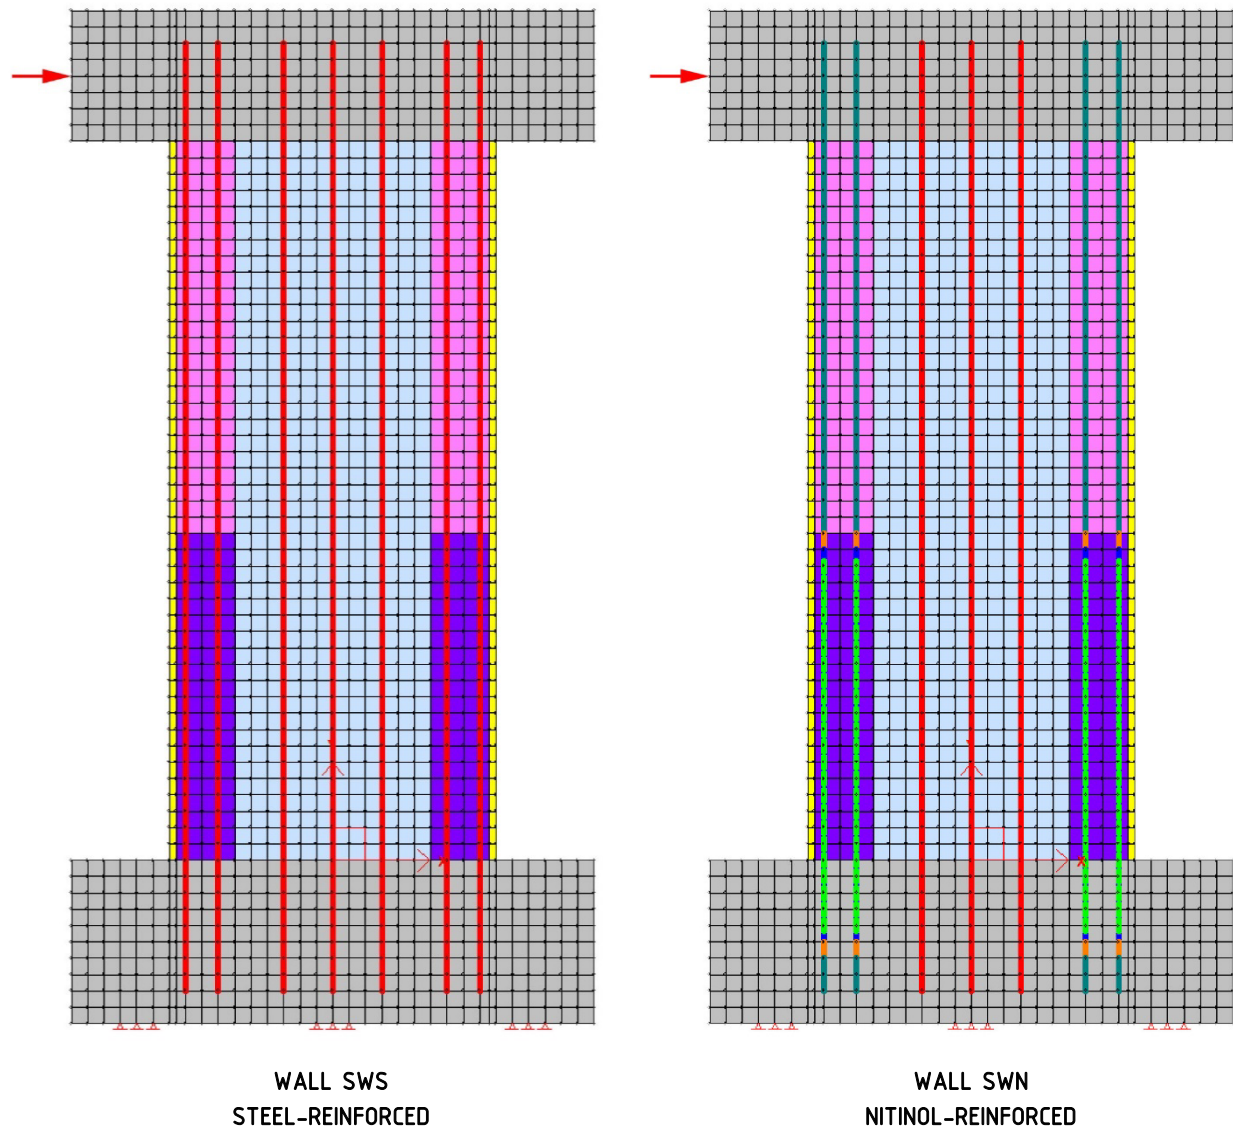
Finite element models of Walls SWS (left) and SWN (right).
